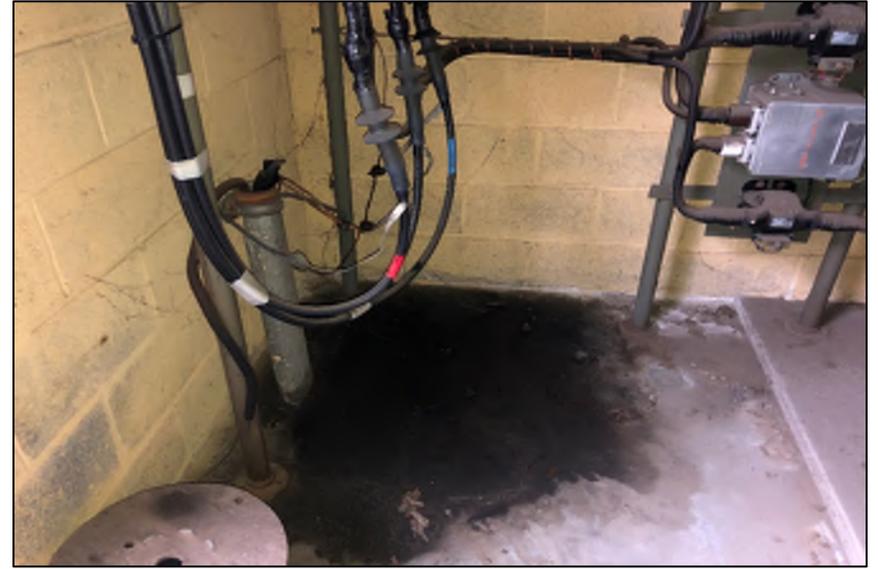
Surface staining under old oil-filled switchgear equipment associated with Passios School.
